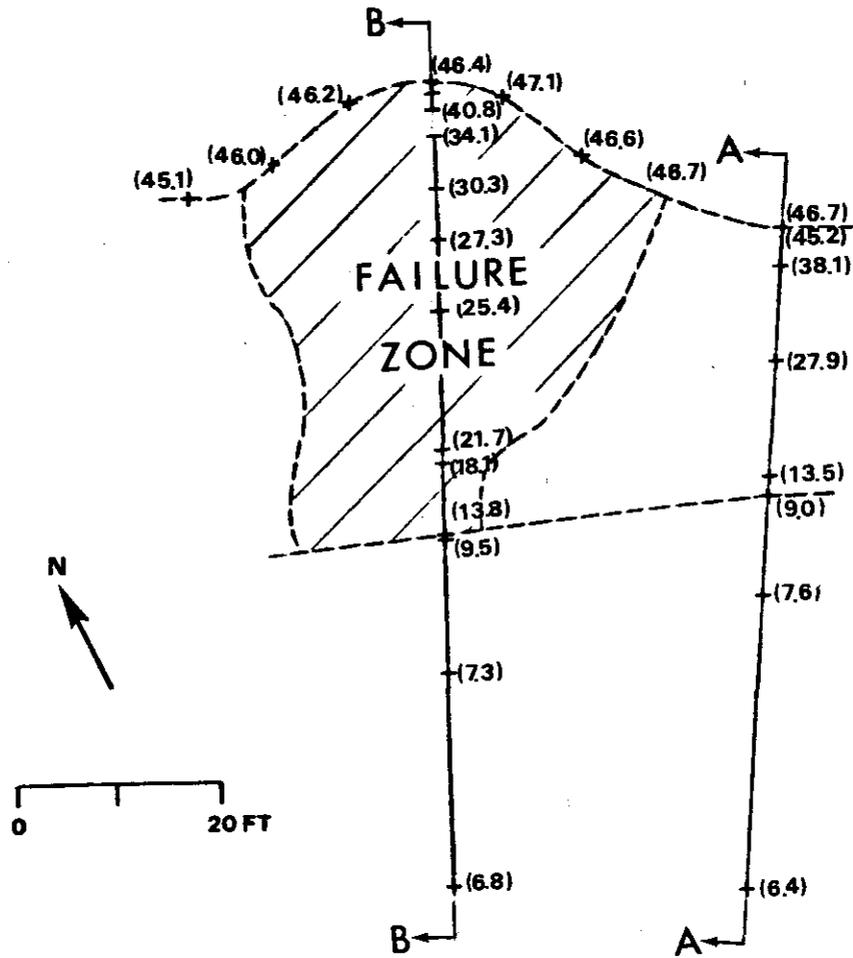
Plan view of failure zone at Bunganuc landslide. (0.0) - indicates elevation in feet above msl.
